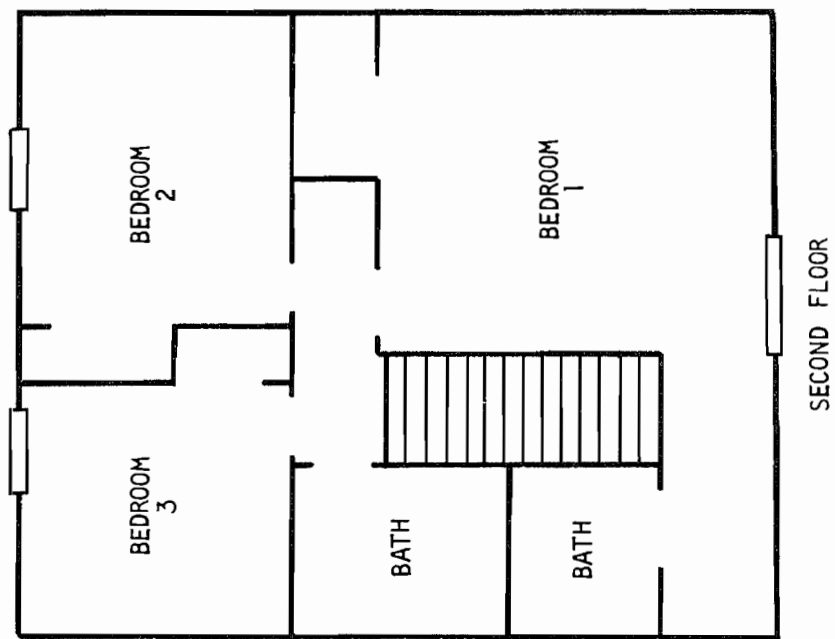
FLOOR PLAN FOR CHARACTERISTIC TOWNHOUSE RESIDENCE
